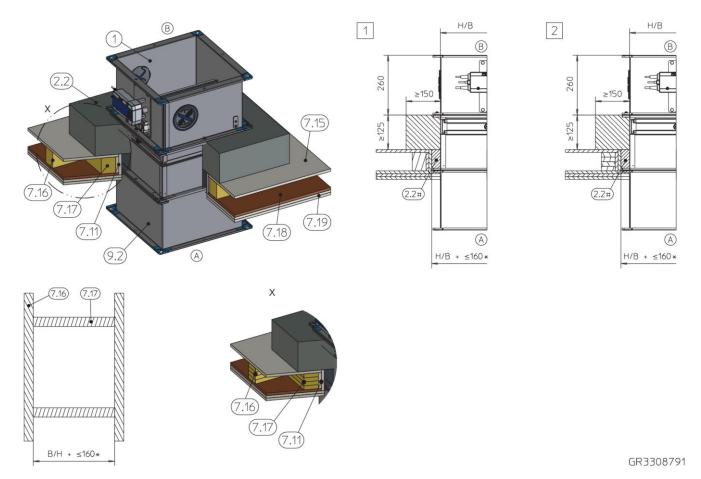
Mortar-based installation into a solid ceiling slab in combination with a wooden beam ceiling, upright (illustration is an example; installation in other wooden beam ceilings may be possible depending on local conditions)
